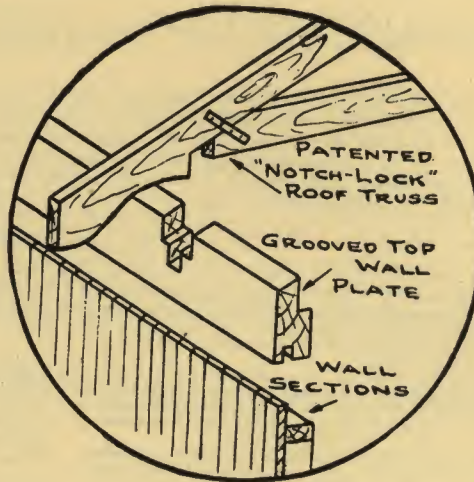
DETAILS "PRESTO-UP" PATENTED CONSTRUCTION
